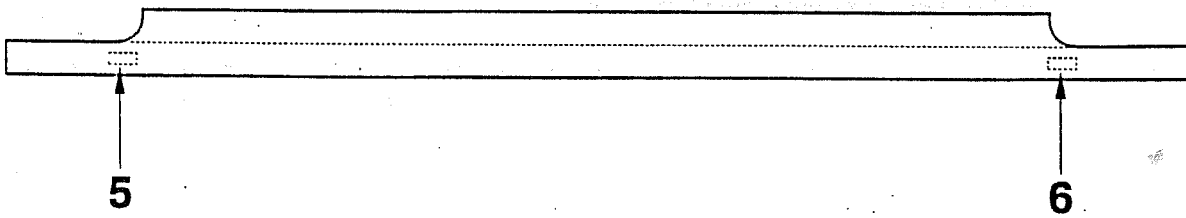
Strain gage locations and designations for instrumented diaphragms on the Brandon Road bascule bridge.
